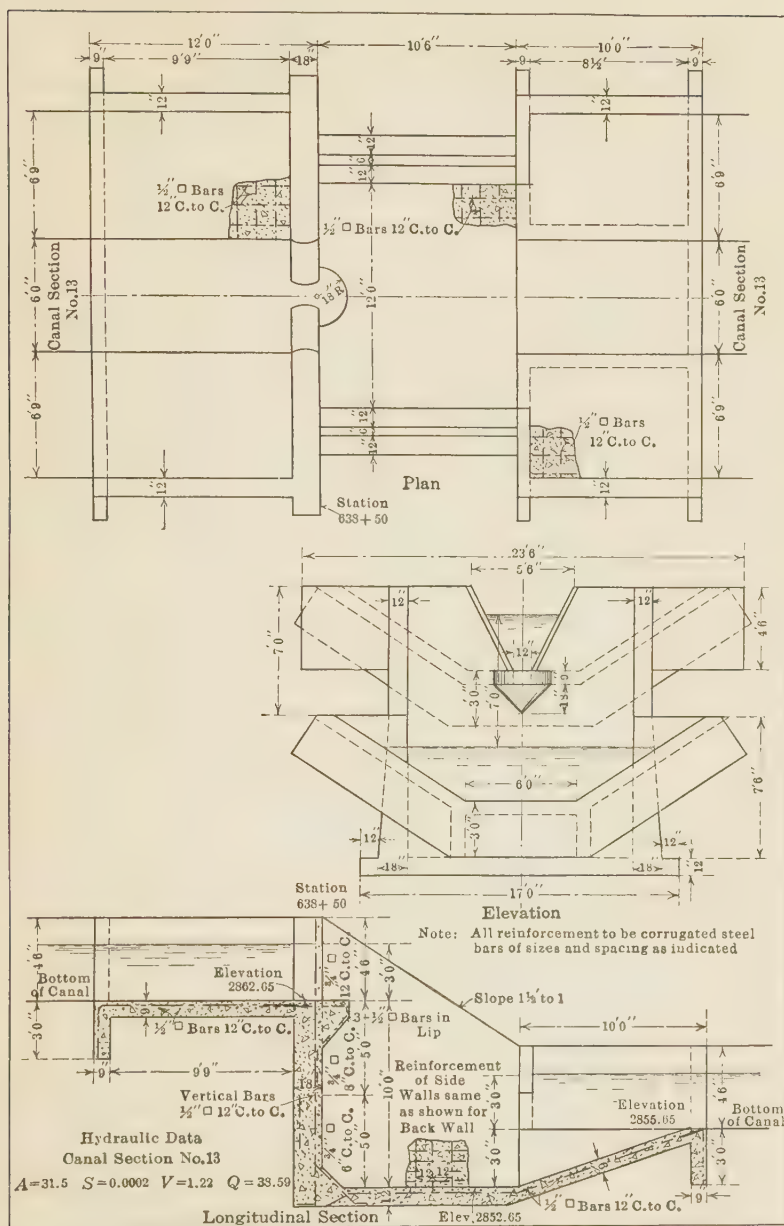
Small reinforced concrete notch drop. Huntley Project, Mont.
